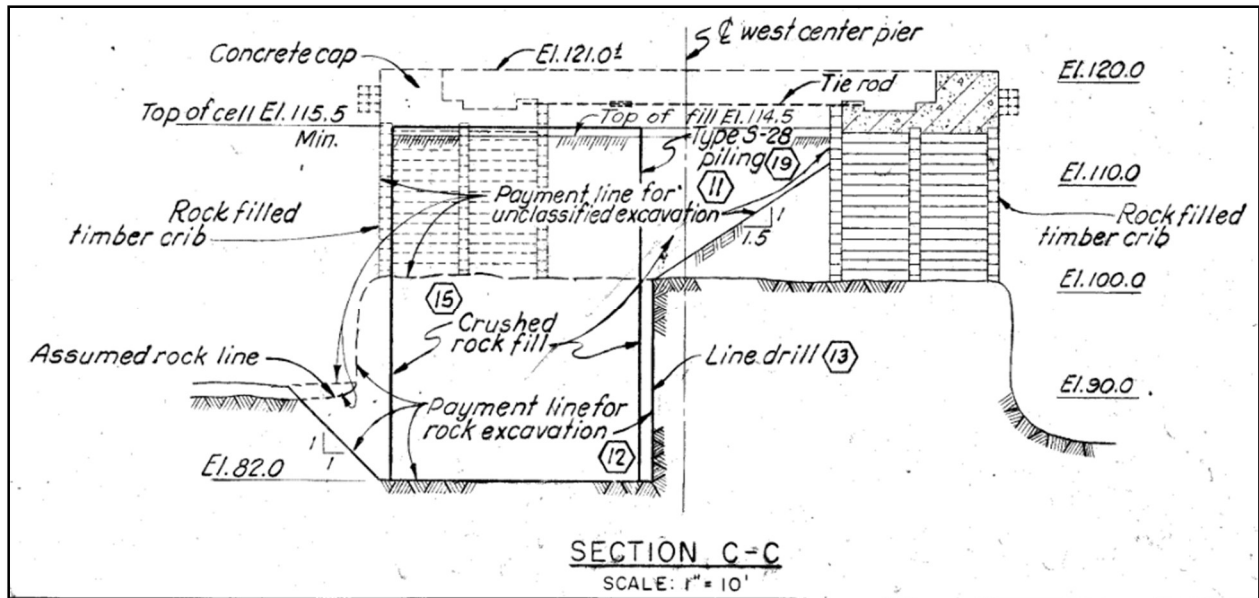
1964 WCP Extension Drawings – Demo Section C-C
